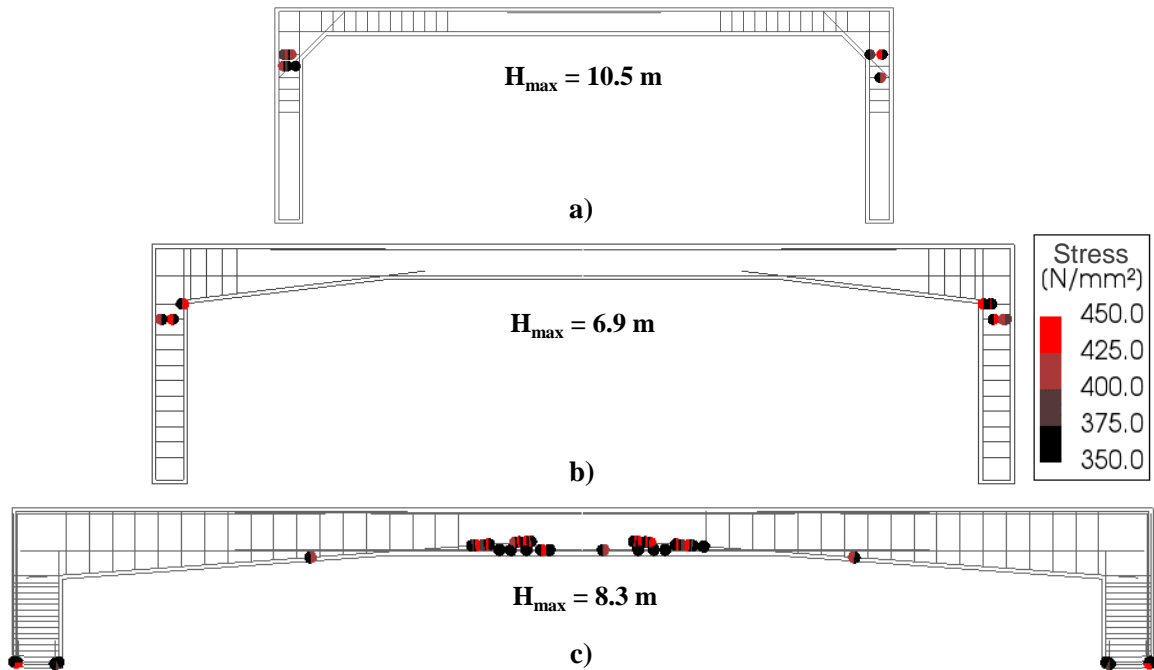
Reinforcement yield points at failure: a) Remembrance culvert; b) Pickering culvert; and c) Oshawa culvert.
